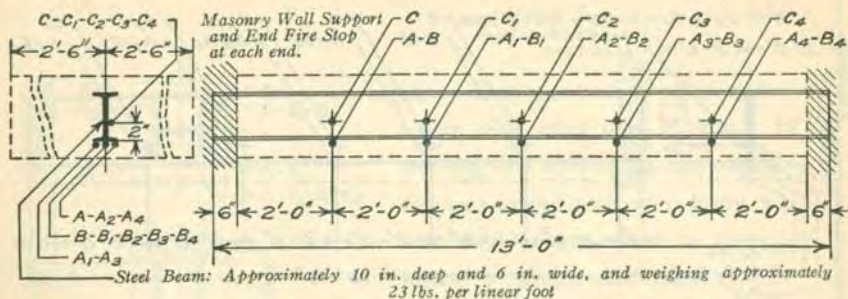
Beam Fireproofing Test for Flush Ceiling
